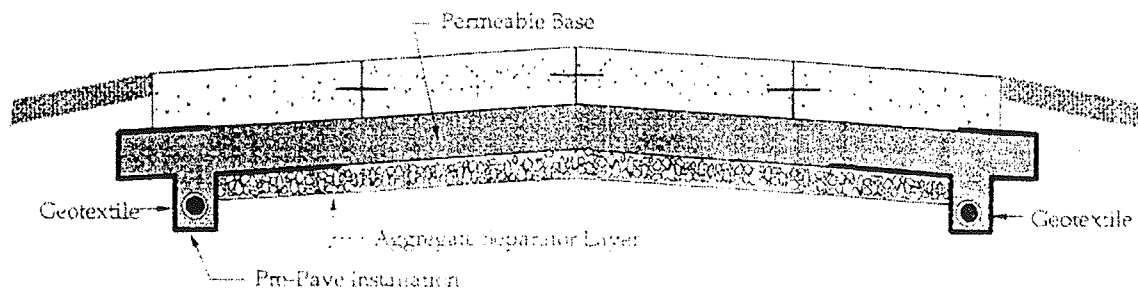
Pre-pave geotextile installation (FHWA 1992).
